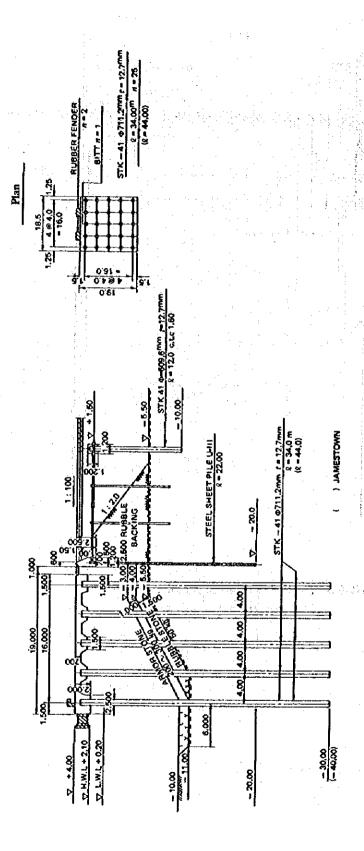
Typical Section of General Cargo Wharf (Jamestown, Opobo)
